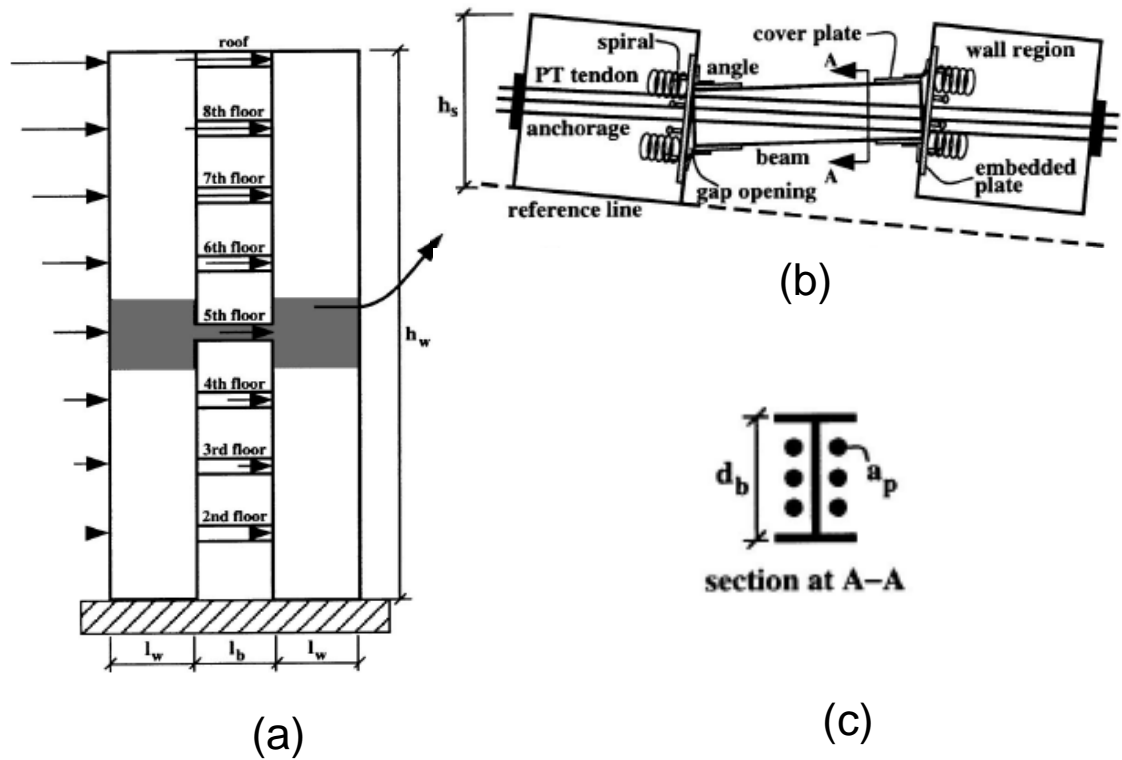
Coupled wall system with sub-assembly connection details investigated by Kurama and Shen [17].
